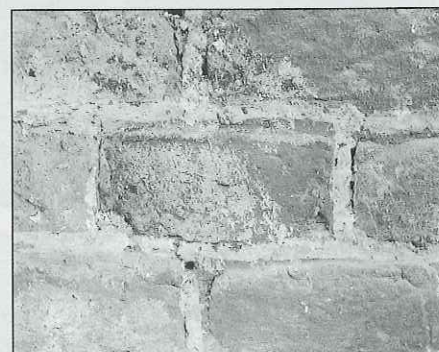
Longport Farmhouse: original ruddle and pencilling on brickwork of first floor fireplace jamb.
